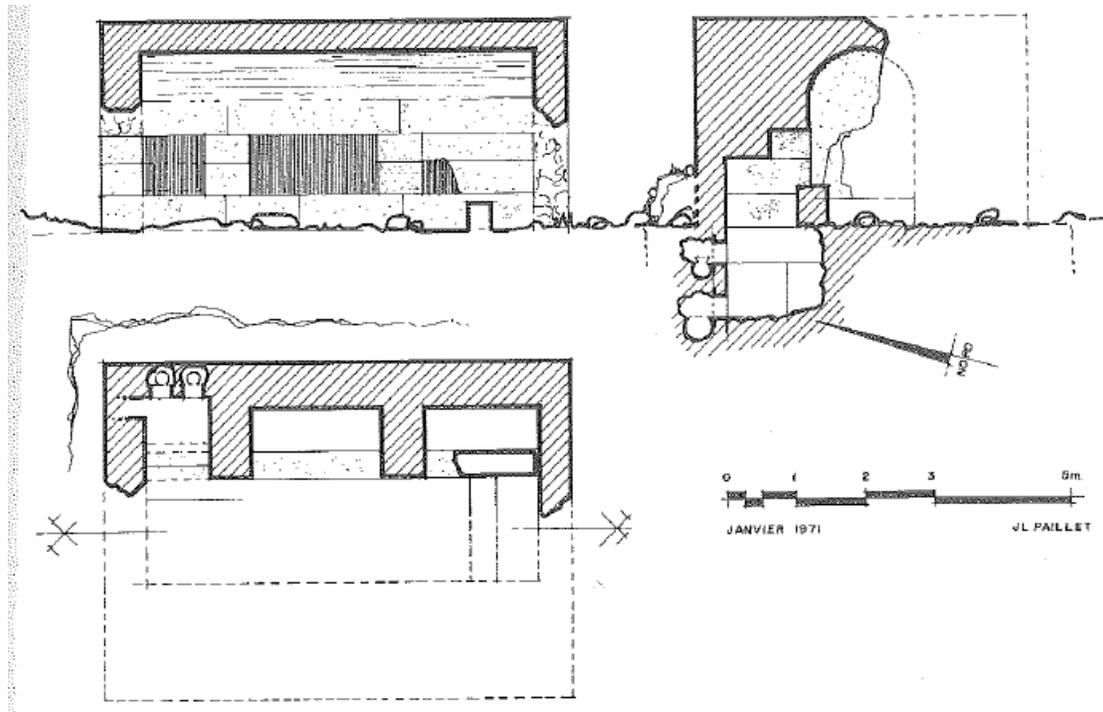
Cross-sections and plan of columbarium at Cave-Hardy, Algeria.
